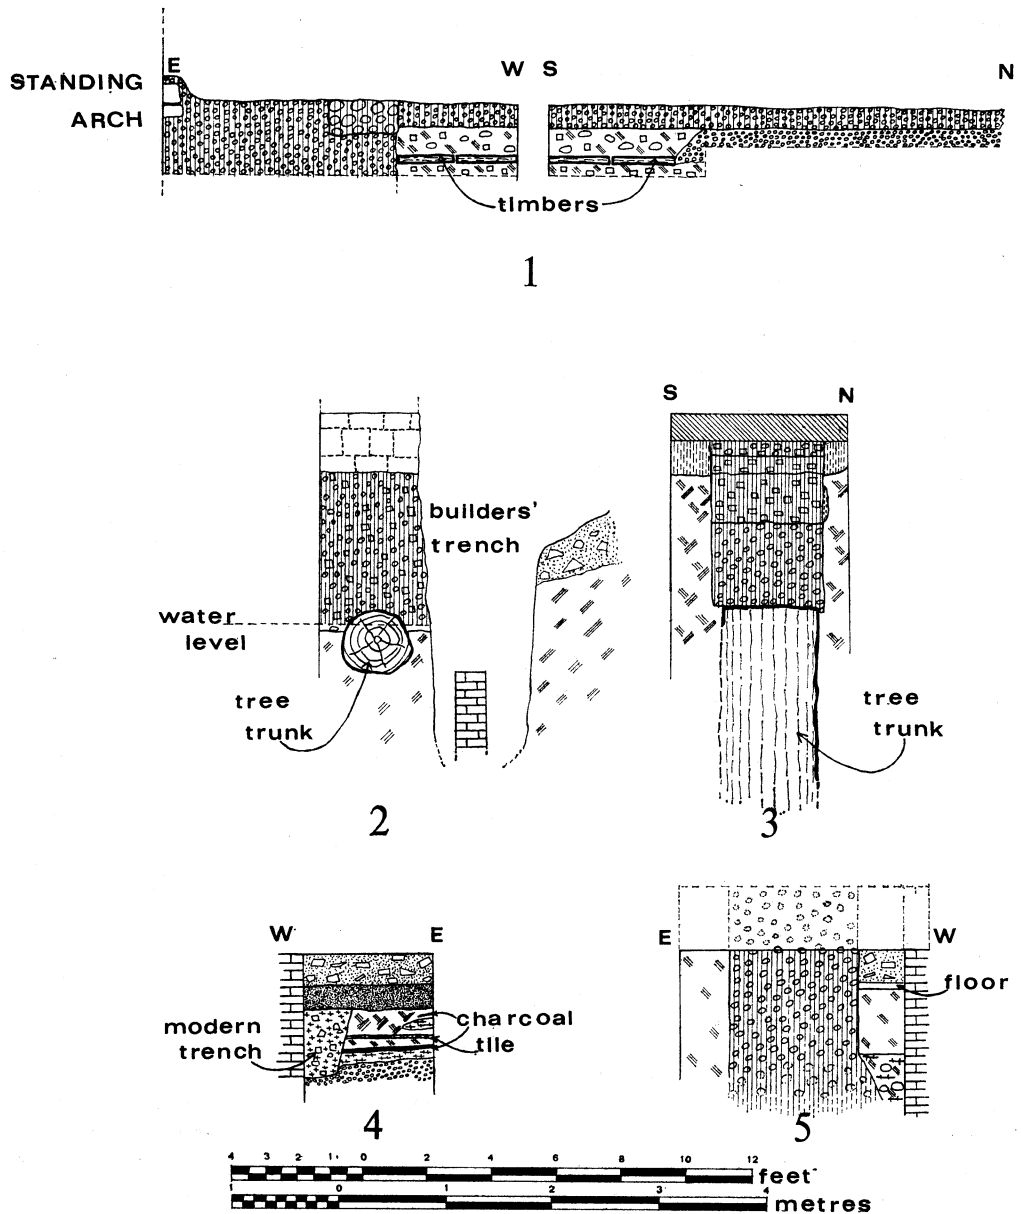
Abbey Mill Site : Sections : for Key see Fig. 4. 1. Footings in area West of Standing Arches. 2. South Footing of Footings of Eastern Arches : East face. The casing stone, indicated by dotted lines, was destroyed before record. 3. Abbey Wall : Western Stretch. 4. Near footings of Eastern Arches. 5. Footings East of Footings of Eastern Arches. The top 2 ft, indicated by dotted lines, were destroyed before record.
